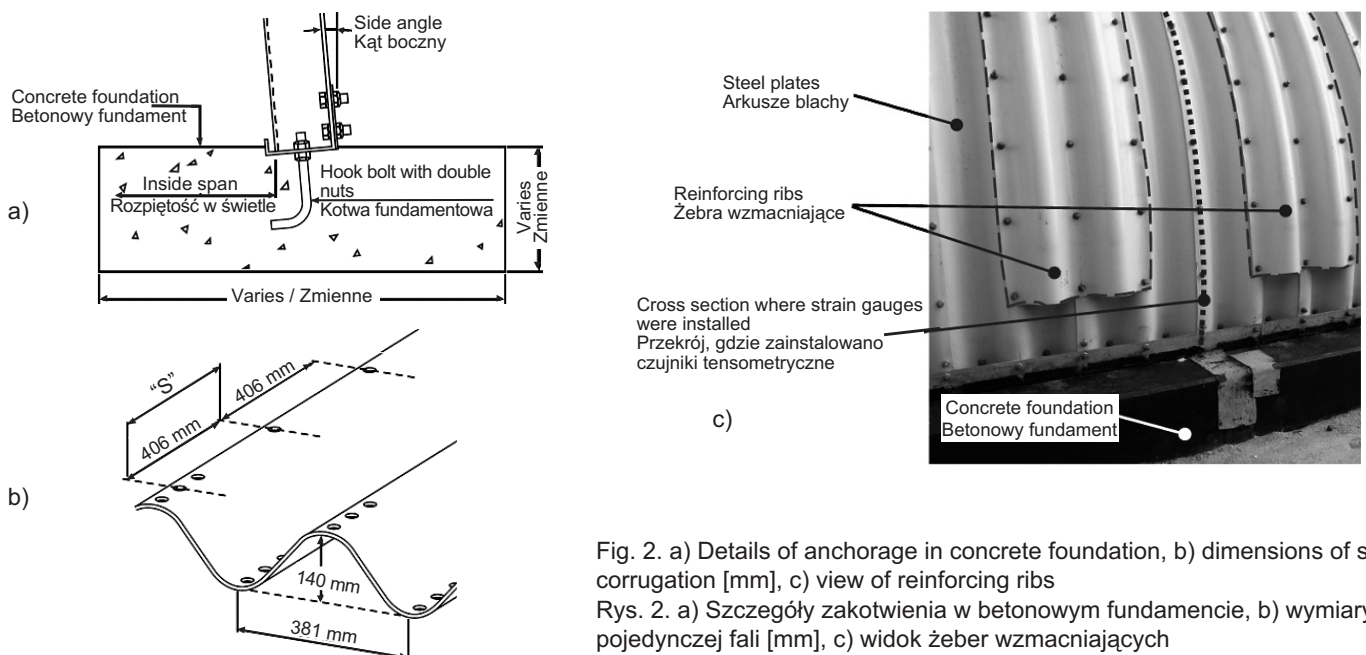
a) Details of anchorage in concrete foundation, b) dimensions of single corrugation [mm], c) view of reinforcing ribs
